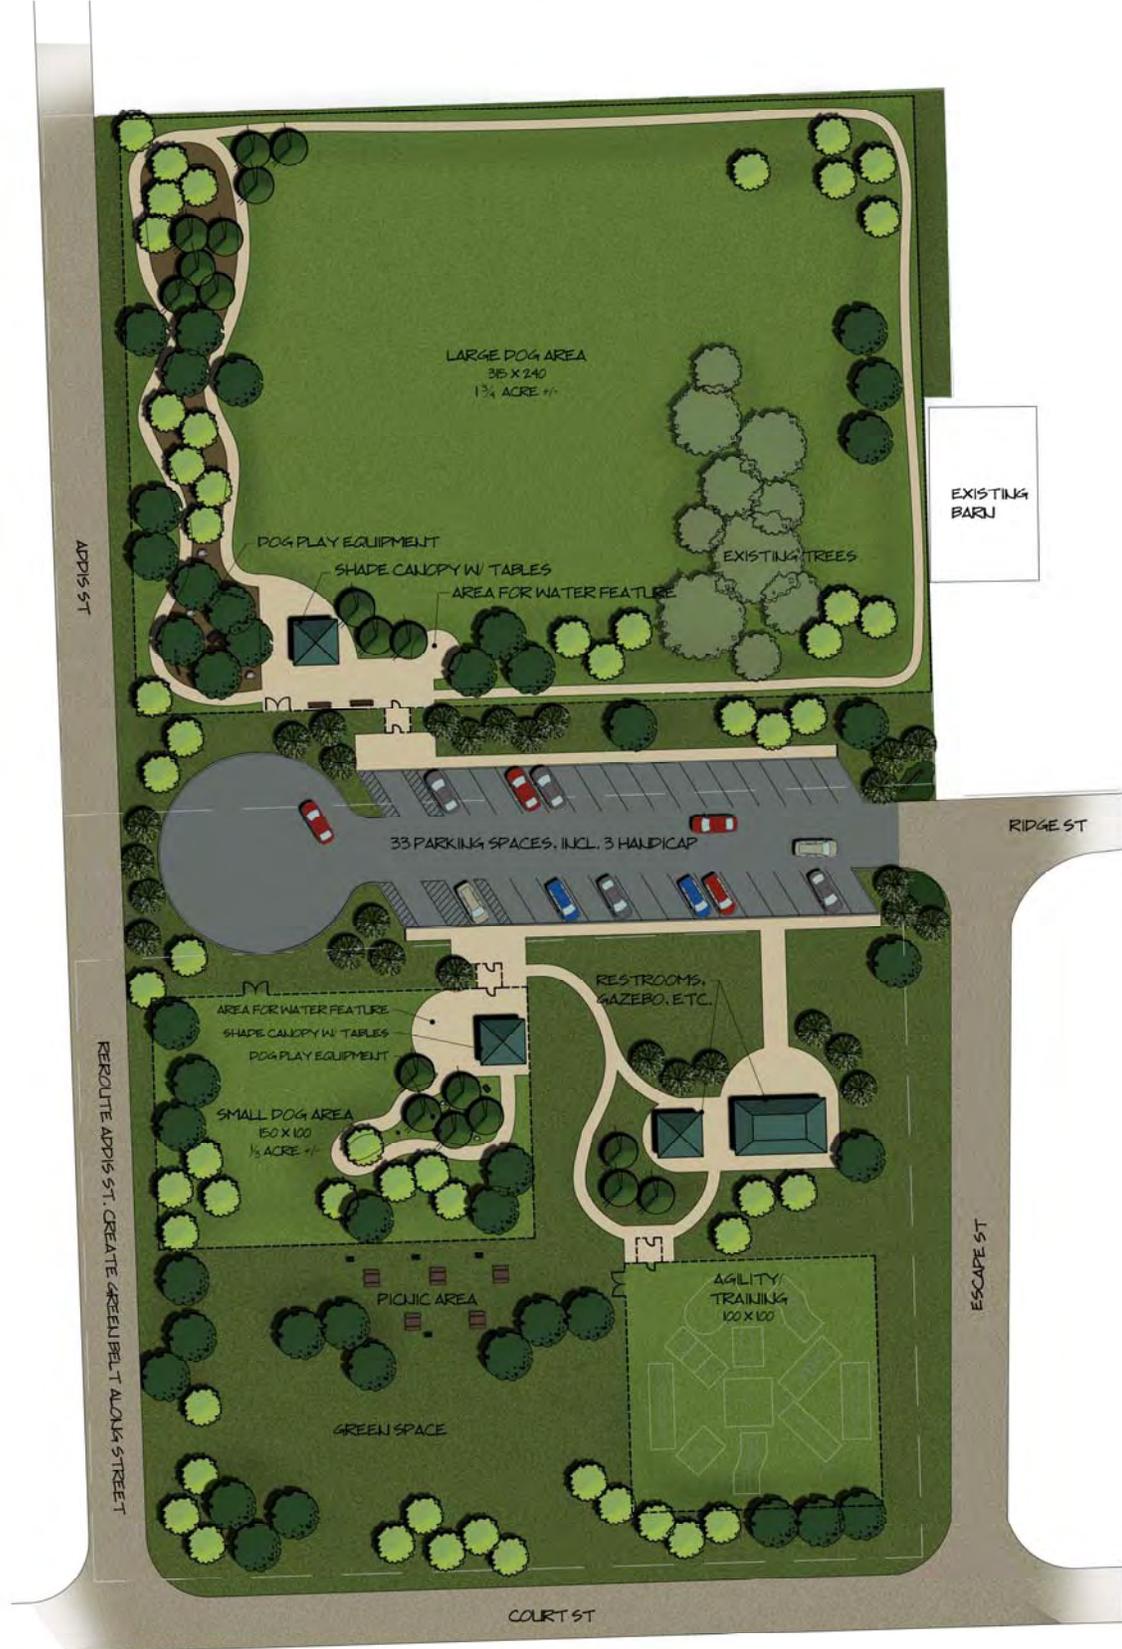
SITE PLAN WITH DIMENSIONS AND EXISTING TREES
